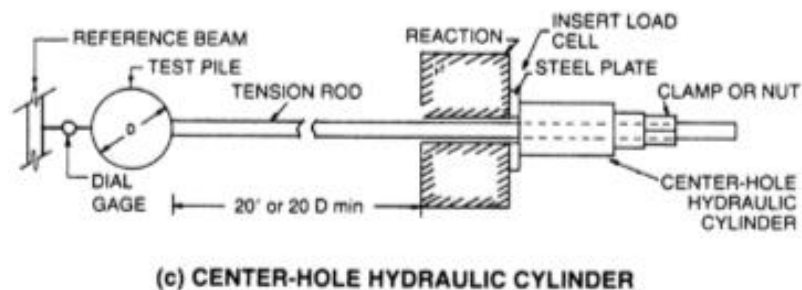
Lateral Load Testing Configuration by Pulling (ASTM 2007)
